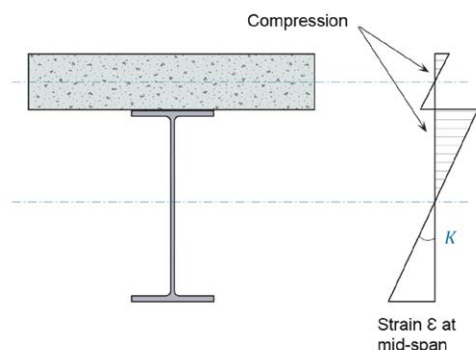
Strain as a function of depth for a concrete slab on a steel beam cross-section
